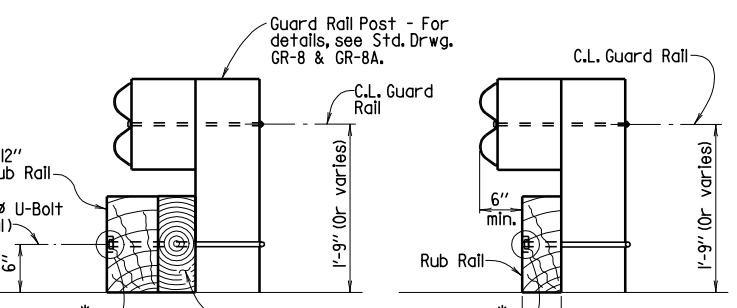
DETAILS OF RUB RAIL (CONC. PARAPET BRIDGE RAIL)
